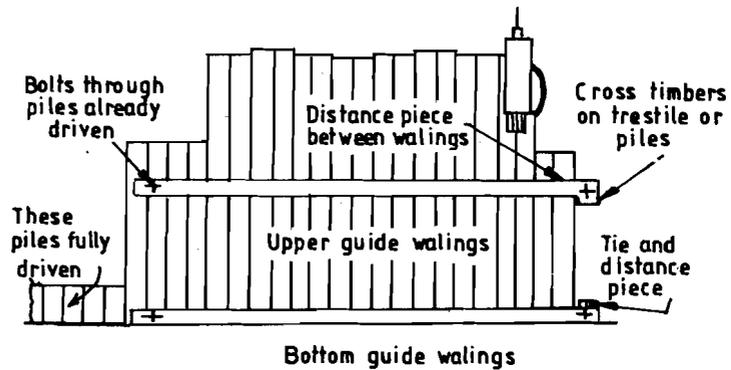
Guide Wallings for Driving Sheet Piles
